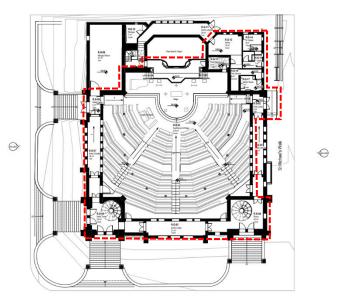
Existing Ground Floor Plan of the heritage place with project area indicated in red. Source: Trethowan Architecture, 2024.
